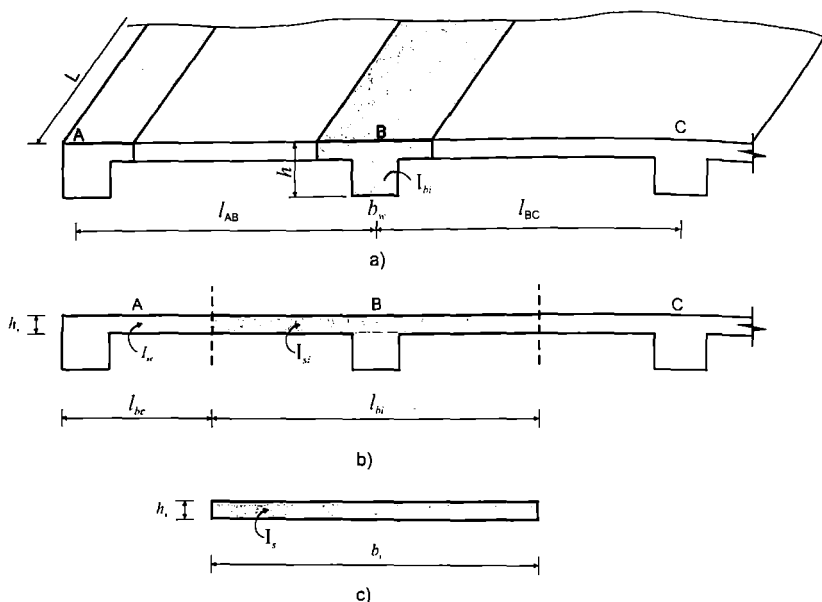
Beam and slab properties for an end span and an interior span: a) beam sections; b) slab properties, and c) a typical slab cross-section.
